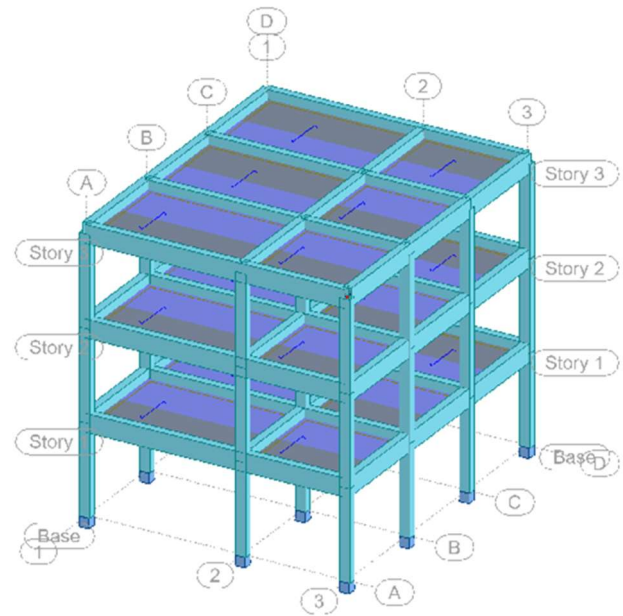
RSAP Model C: Reinforced Concrete Frame with One-Way X Cladding Element Showing the Spanning Direction
